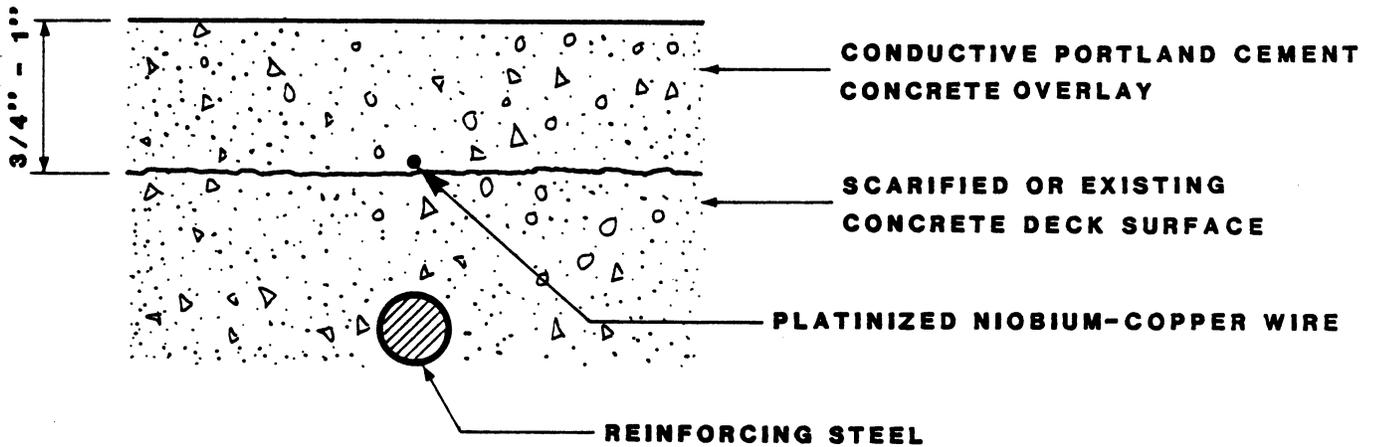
Conceptual plan showing portion of the transverse cross section of the CP system utilizing a conductive portland cement concrete.
